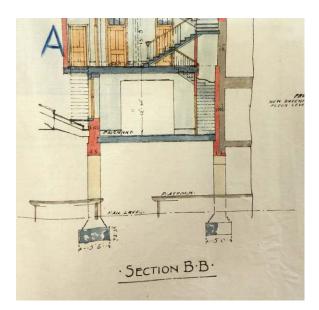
Sectional elevation, 1916. (GLC/AR/BR/22/BA/043620)
